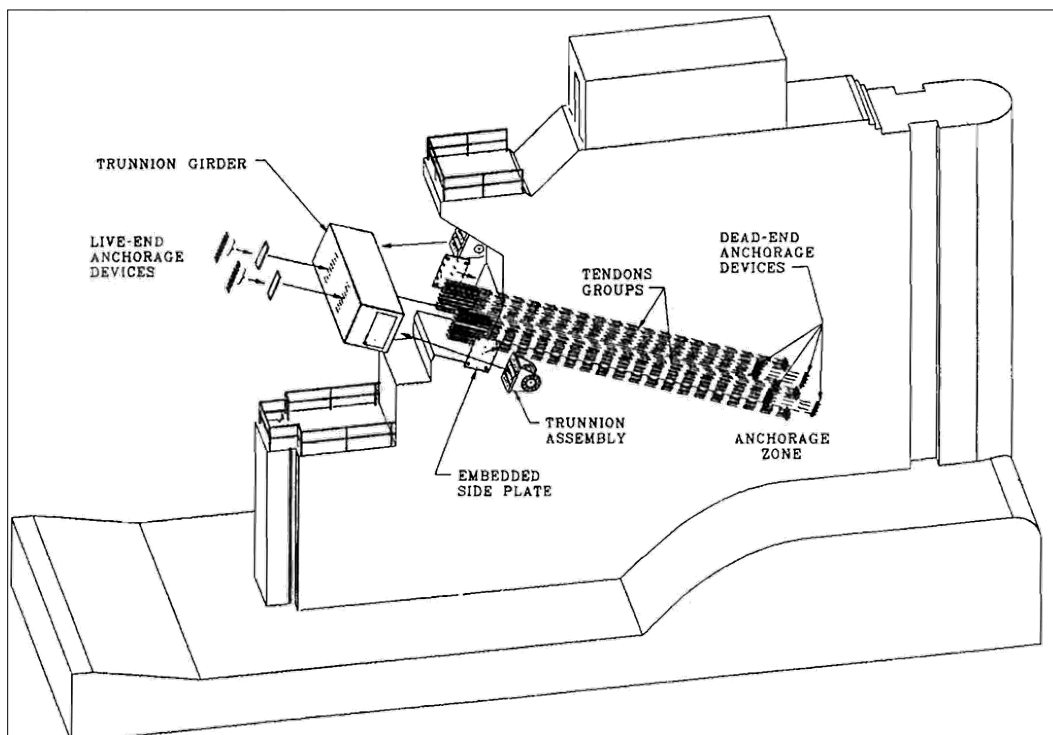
Trunnion anchorage design (from EM 1110-2-2702).
